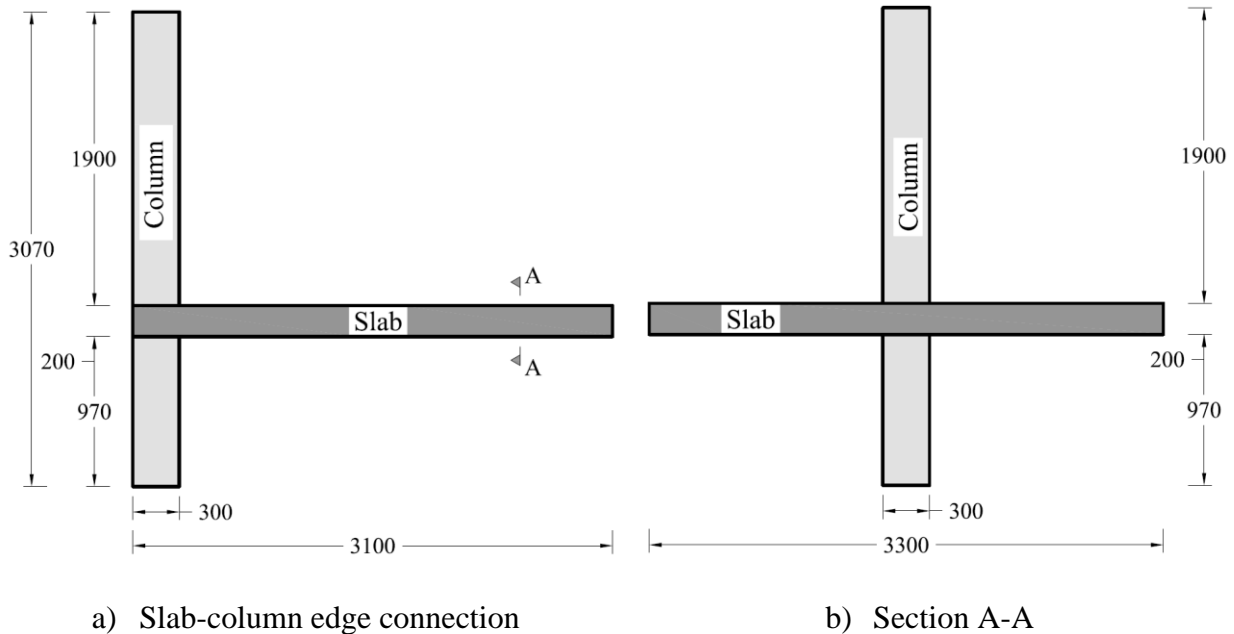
Typical dimensions of isolated slab-column edge connections (dimensions in mm)
